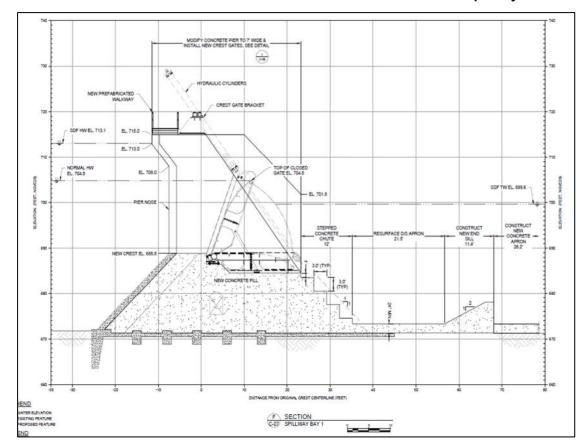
Cross Section View of Smallwood Dam Crest Gate Spillway
